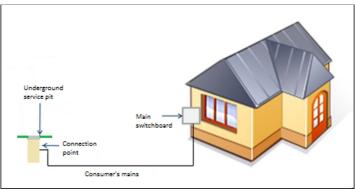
Typical Uunderground Connection for Rresidential Coustomer
